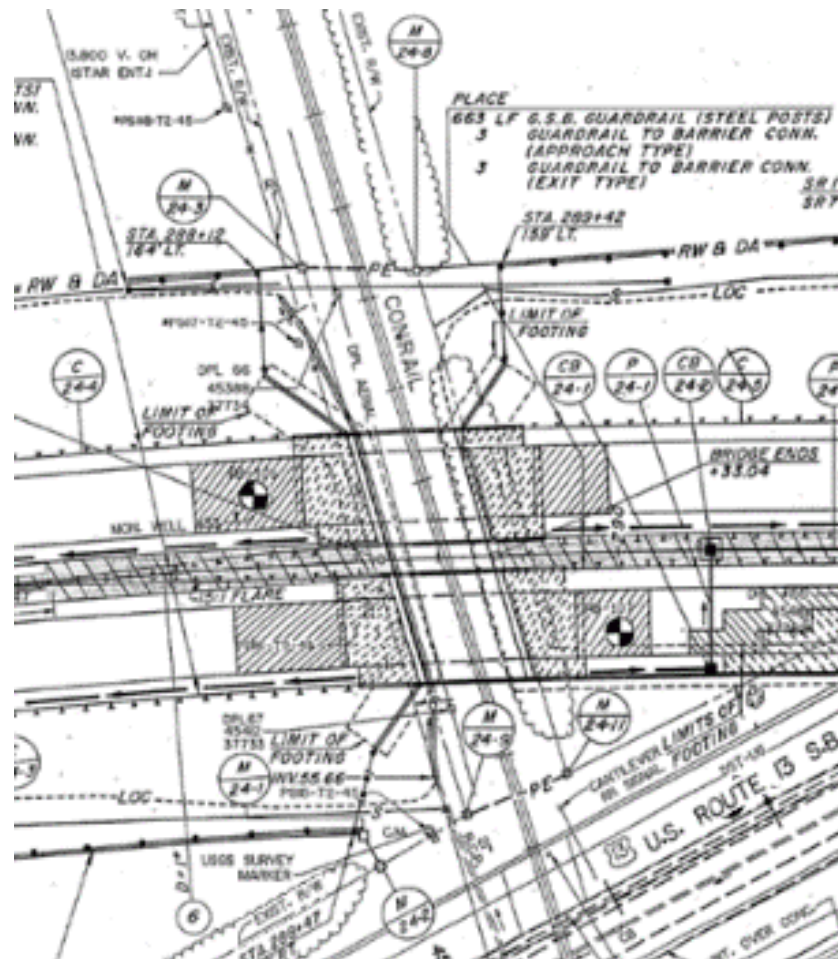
Railroad Crossing with Easement Acquisitions Example
